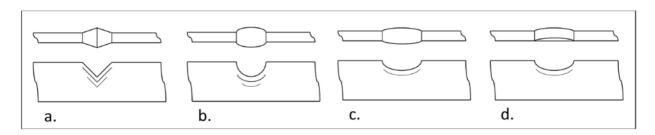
Edge damage forms in plan and elevation: a. V-notch; b. U-notch; c. dent, d. bow
